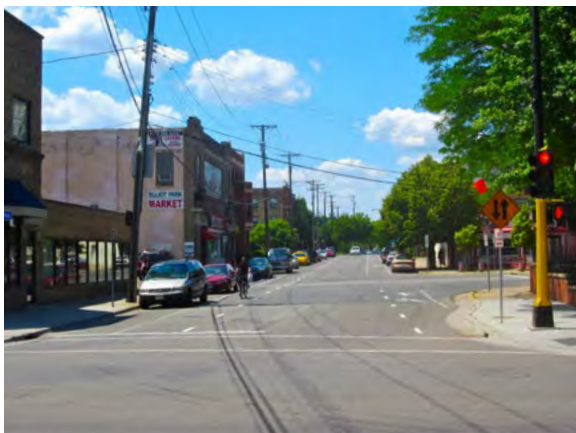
14th Street East facing west at Chicago Avenue South after installation with a 14-foot two-way travel lane
